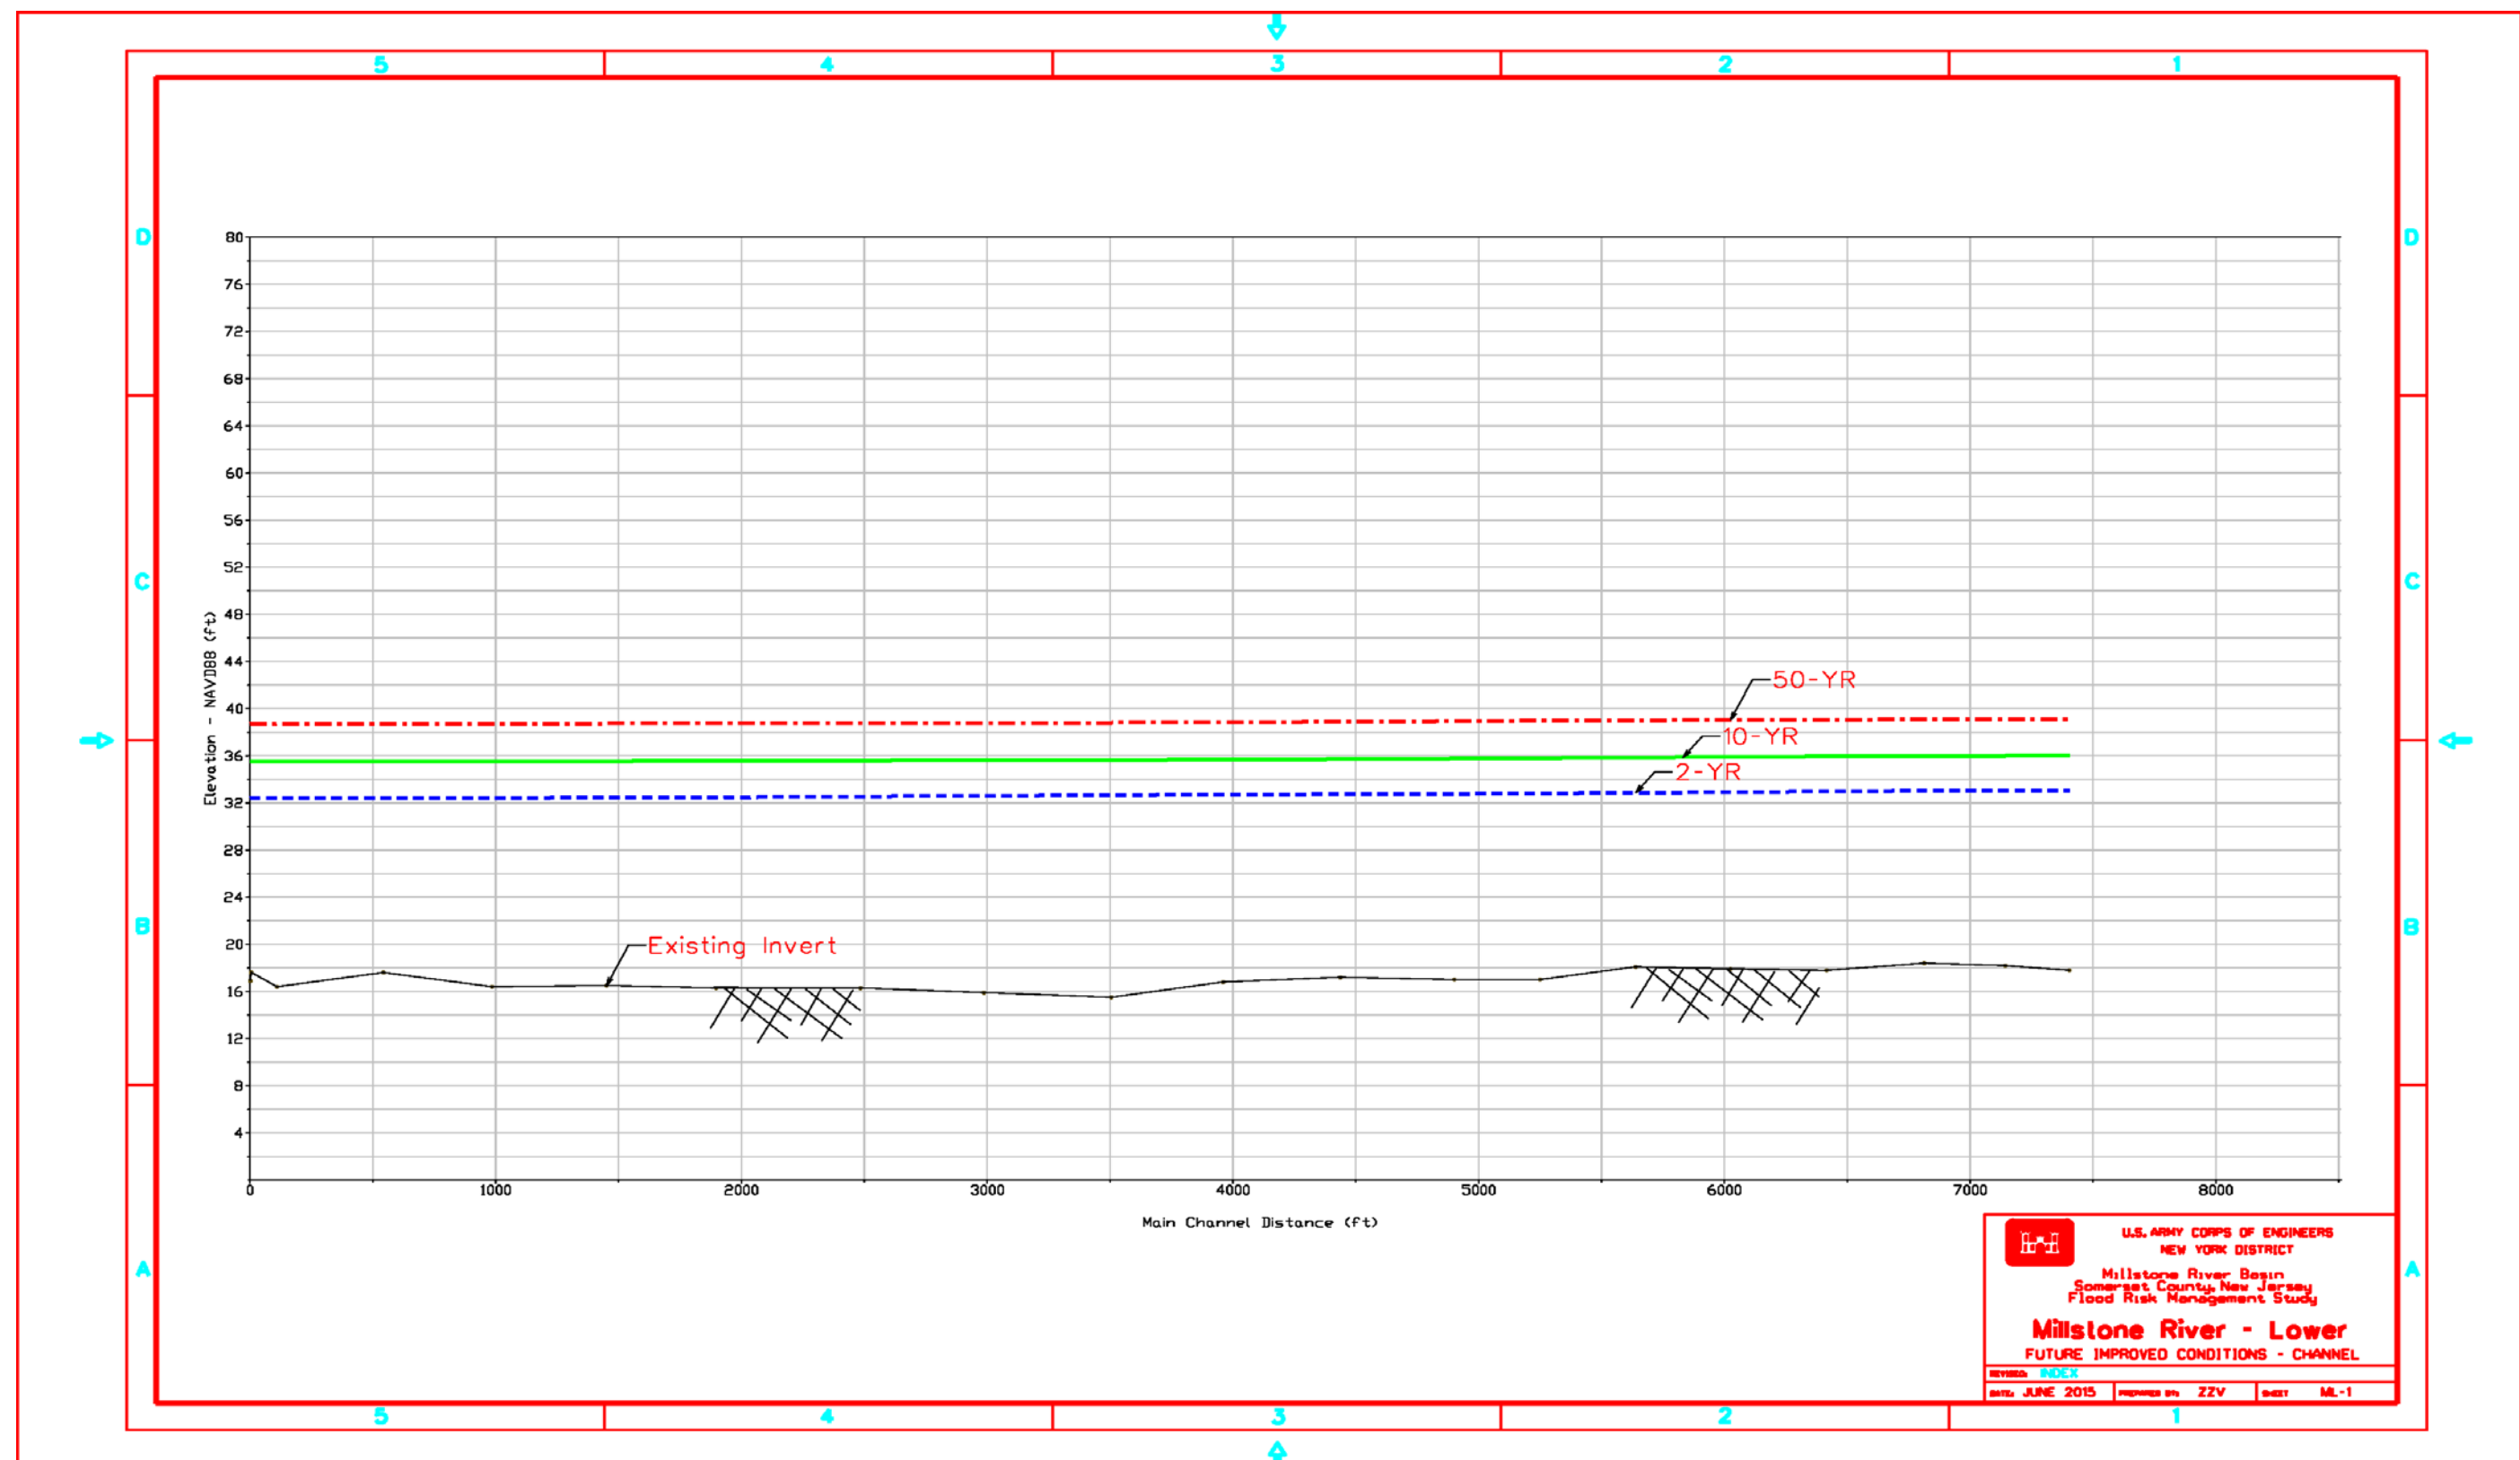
MAXIMUM WATER SURFACE PROFILE FOR CHANNEL PLAN - FUTURE IMPROVED CONDITIONS (MILLSTONE RIVER LOWER)
